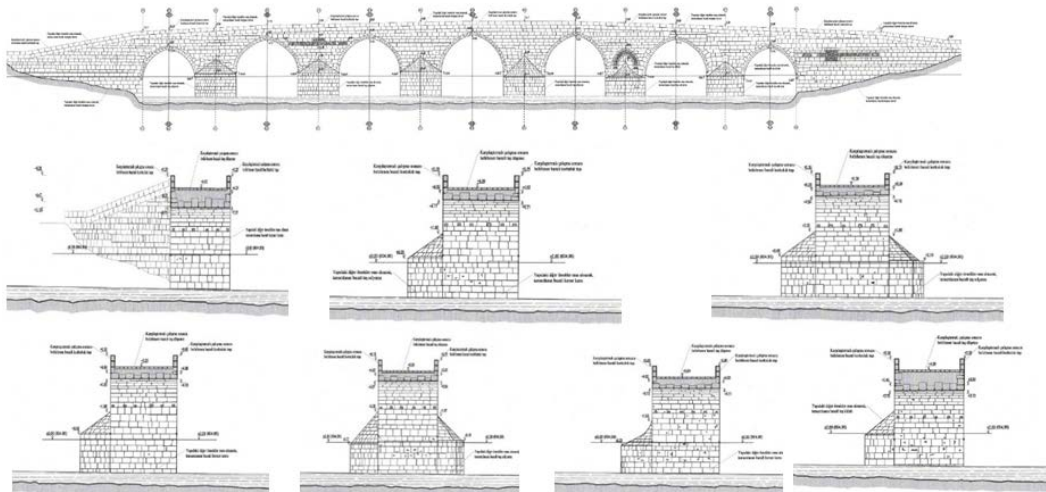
Halilviran Bridge. Section and elevation views with indication of the main geometrical dimensions [22].
